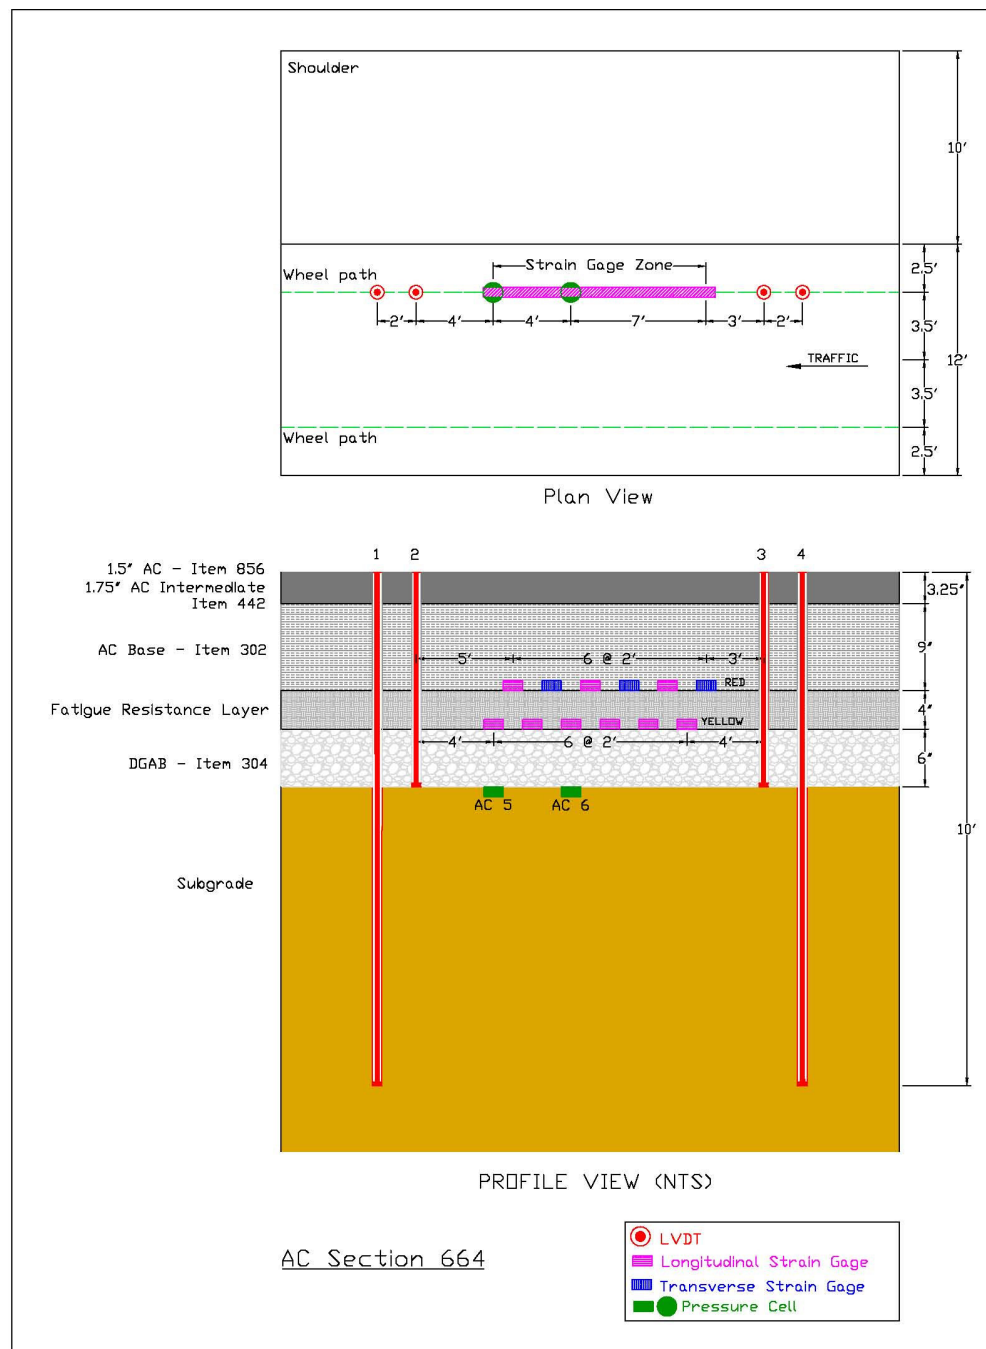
Instrumentation plan of test section 664 (courtesy of Khoury)
